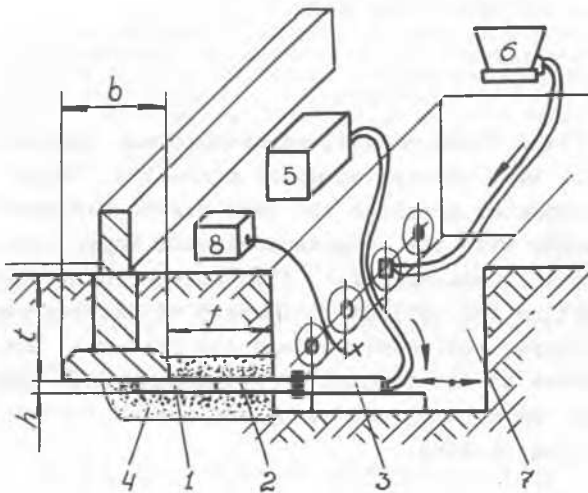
Realization Method Scheme. 1 - the first section of the pipe with a pin; 2 - the second section of the pipe; 3 - pneumatic drifter; 4 - compressed ground zone; 5 - compressor; 6 - device to deliver the cement solution; 7 - technological pit; 8 - welding set to weld pipes section
